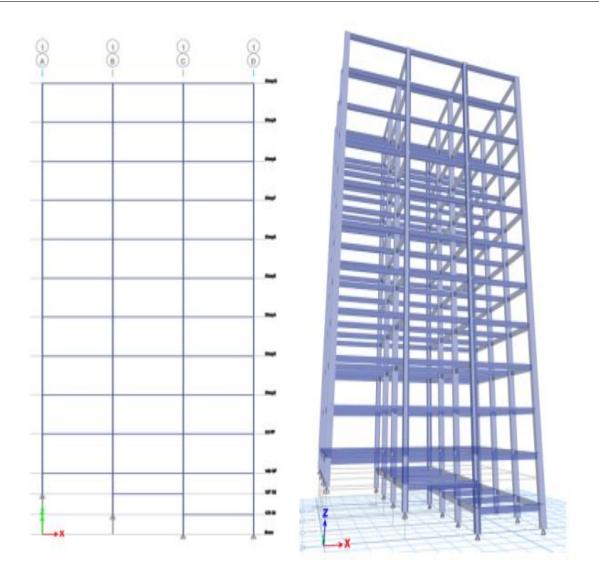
Front elevation and 3D view of 15⁰ model with flexible base
